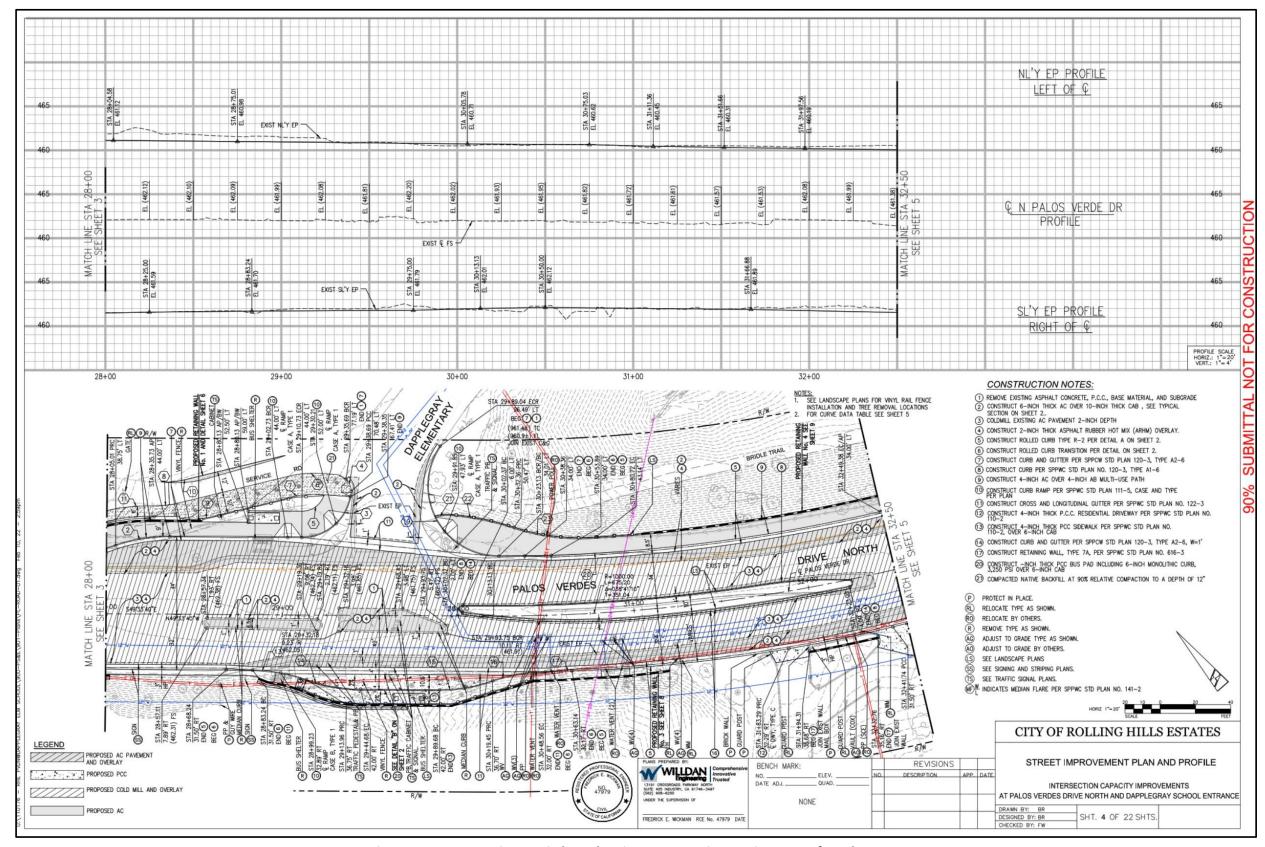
Project 90% Plans Showing Storm Drain Location, East of London Lane
